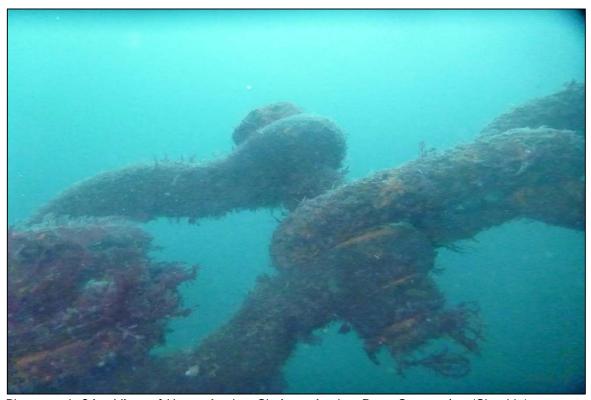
View of Rope to Lower Anchor Chain (Shackle and Sleeve) at Orchard Rocks South Anchor Line 3, Looking South.
